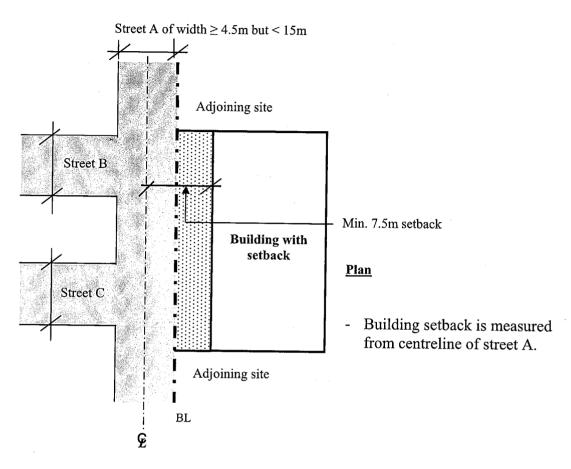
Example (3) of Building Setback - Site abutting streets at intersections
